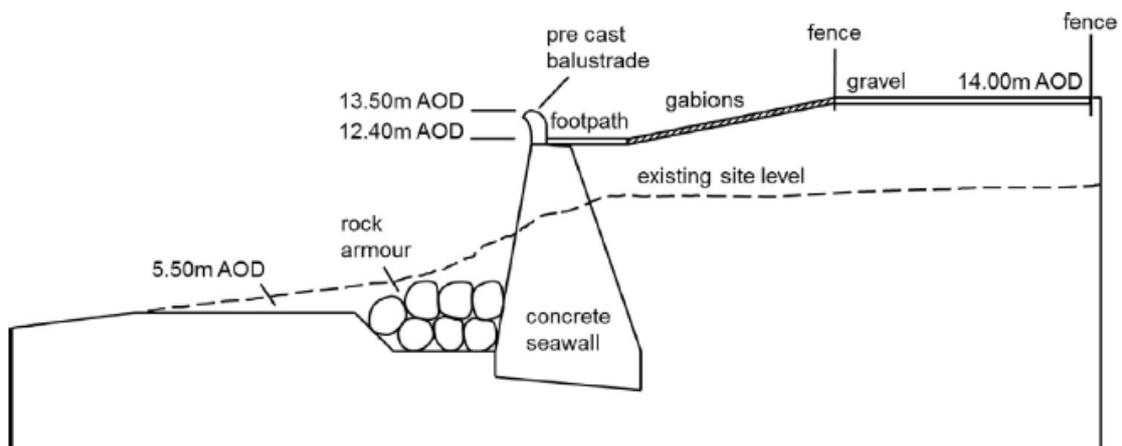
Section through the proposed seawall at Hinkley C power station.
